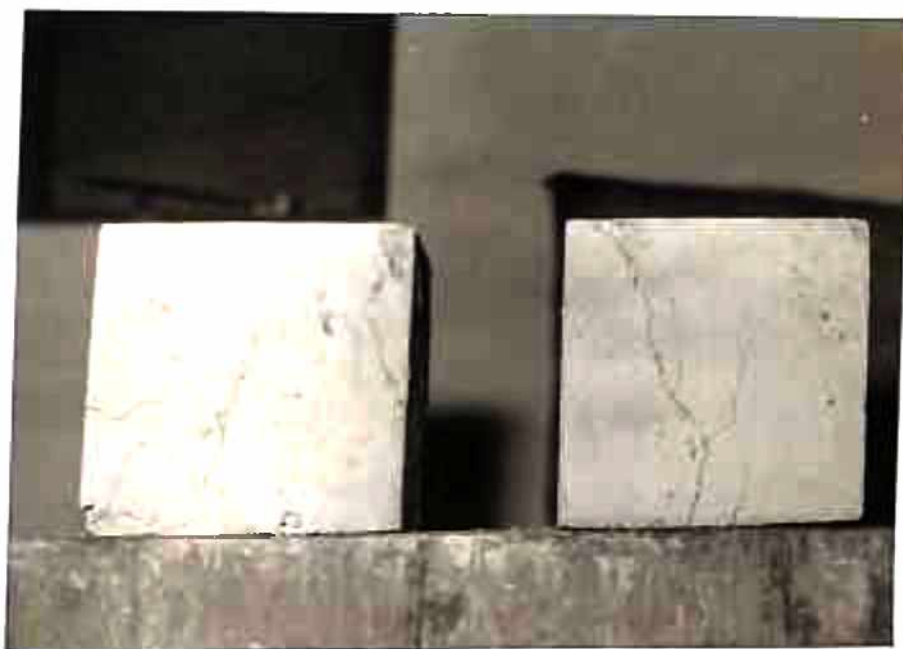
PLAIN CONCRETE CUBES AFTER FAILURE.
